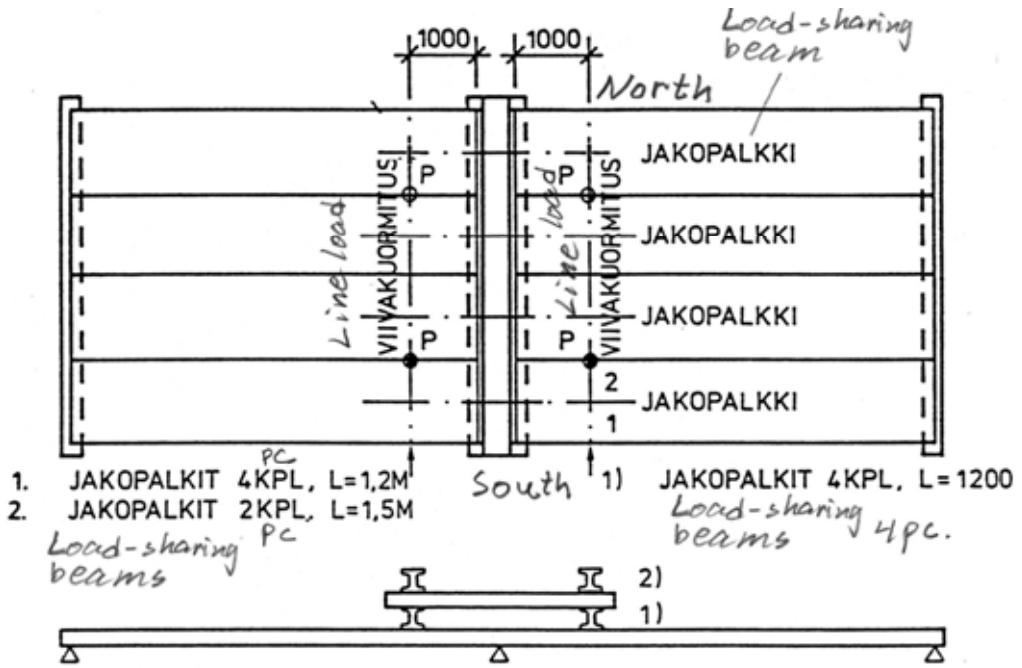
Plan. Beams 1) were 1,2 m long cuts of railway rails, There was a small gap between the ends of consecutive cuts. The beams between beams 1) and 2) were also cuts of railway rails. Beams 2) were 1,5 m long steel I-profiles. Measures to eliminate the friction between the stacking steel beams were considered unnecessary.
